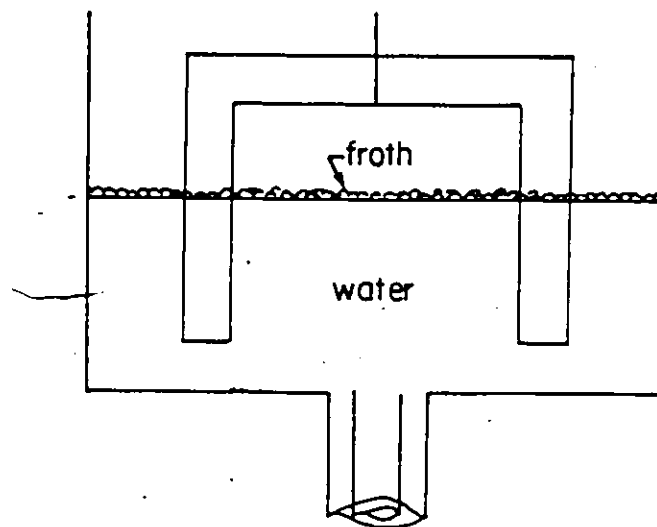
ARRANGEMENT OF THE OUTLET PIPES
